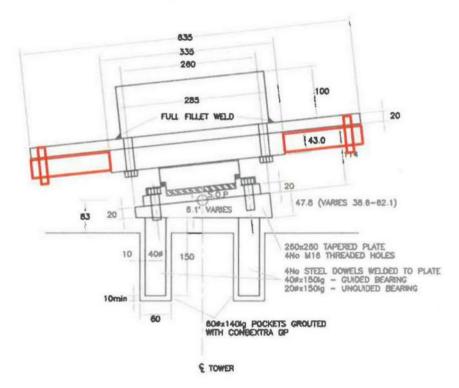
Option for dealing with misalignment if keeping inclined bearings – use of extended bearing top plate (with possible bolt into site-drilled hole in beam soffit plate)
